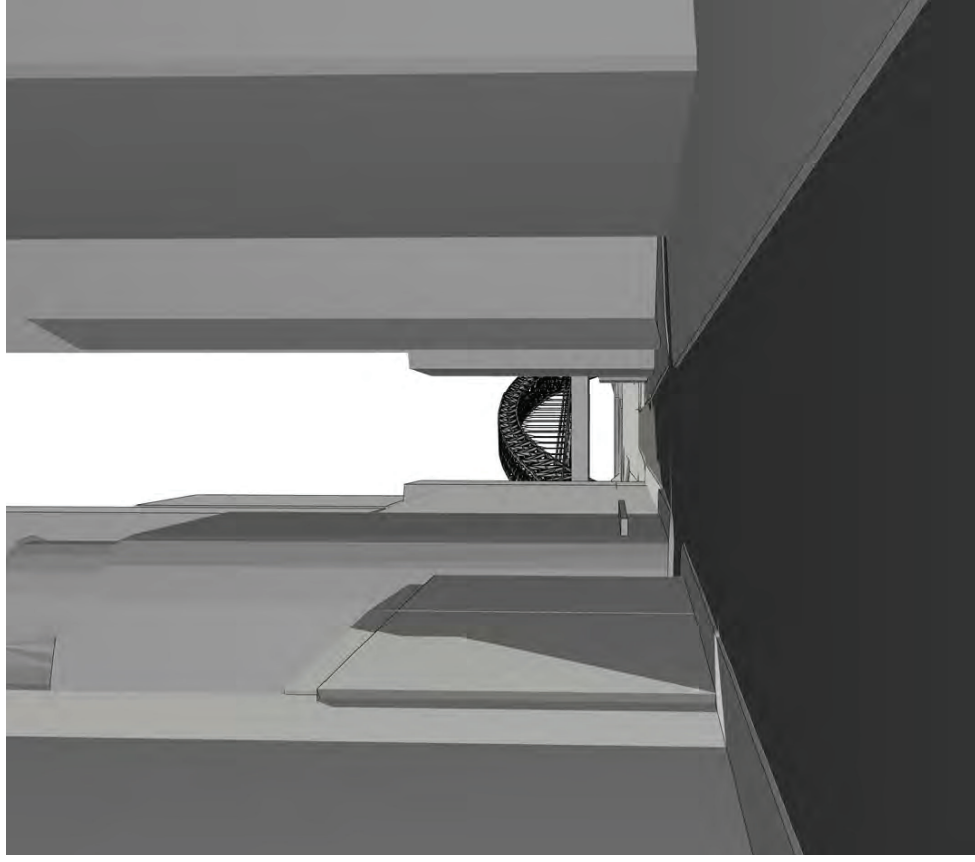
View from Model - Current with 33-35 Pitt Street DA Stage 2.
